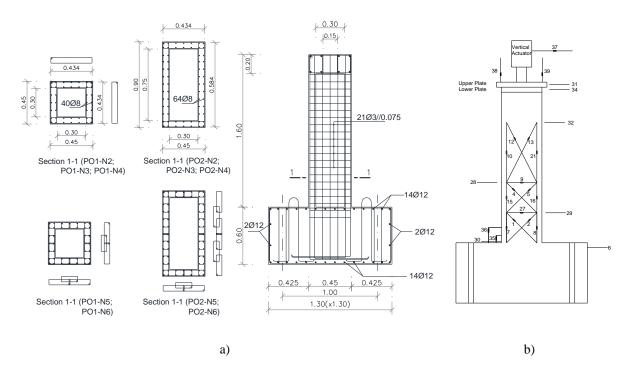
Hollow RC piers: a) geometry of specimen and b) lateral LVDT layout.
